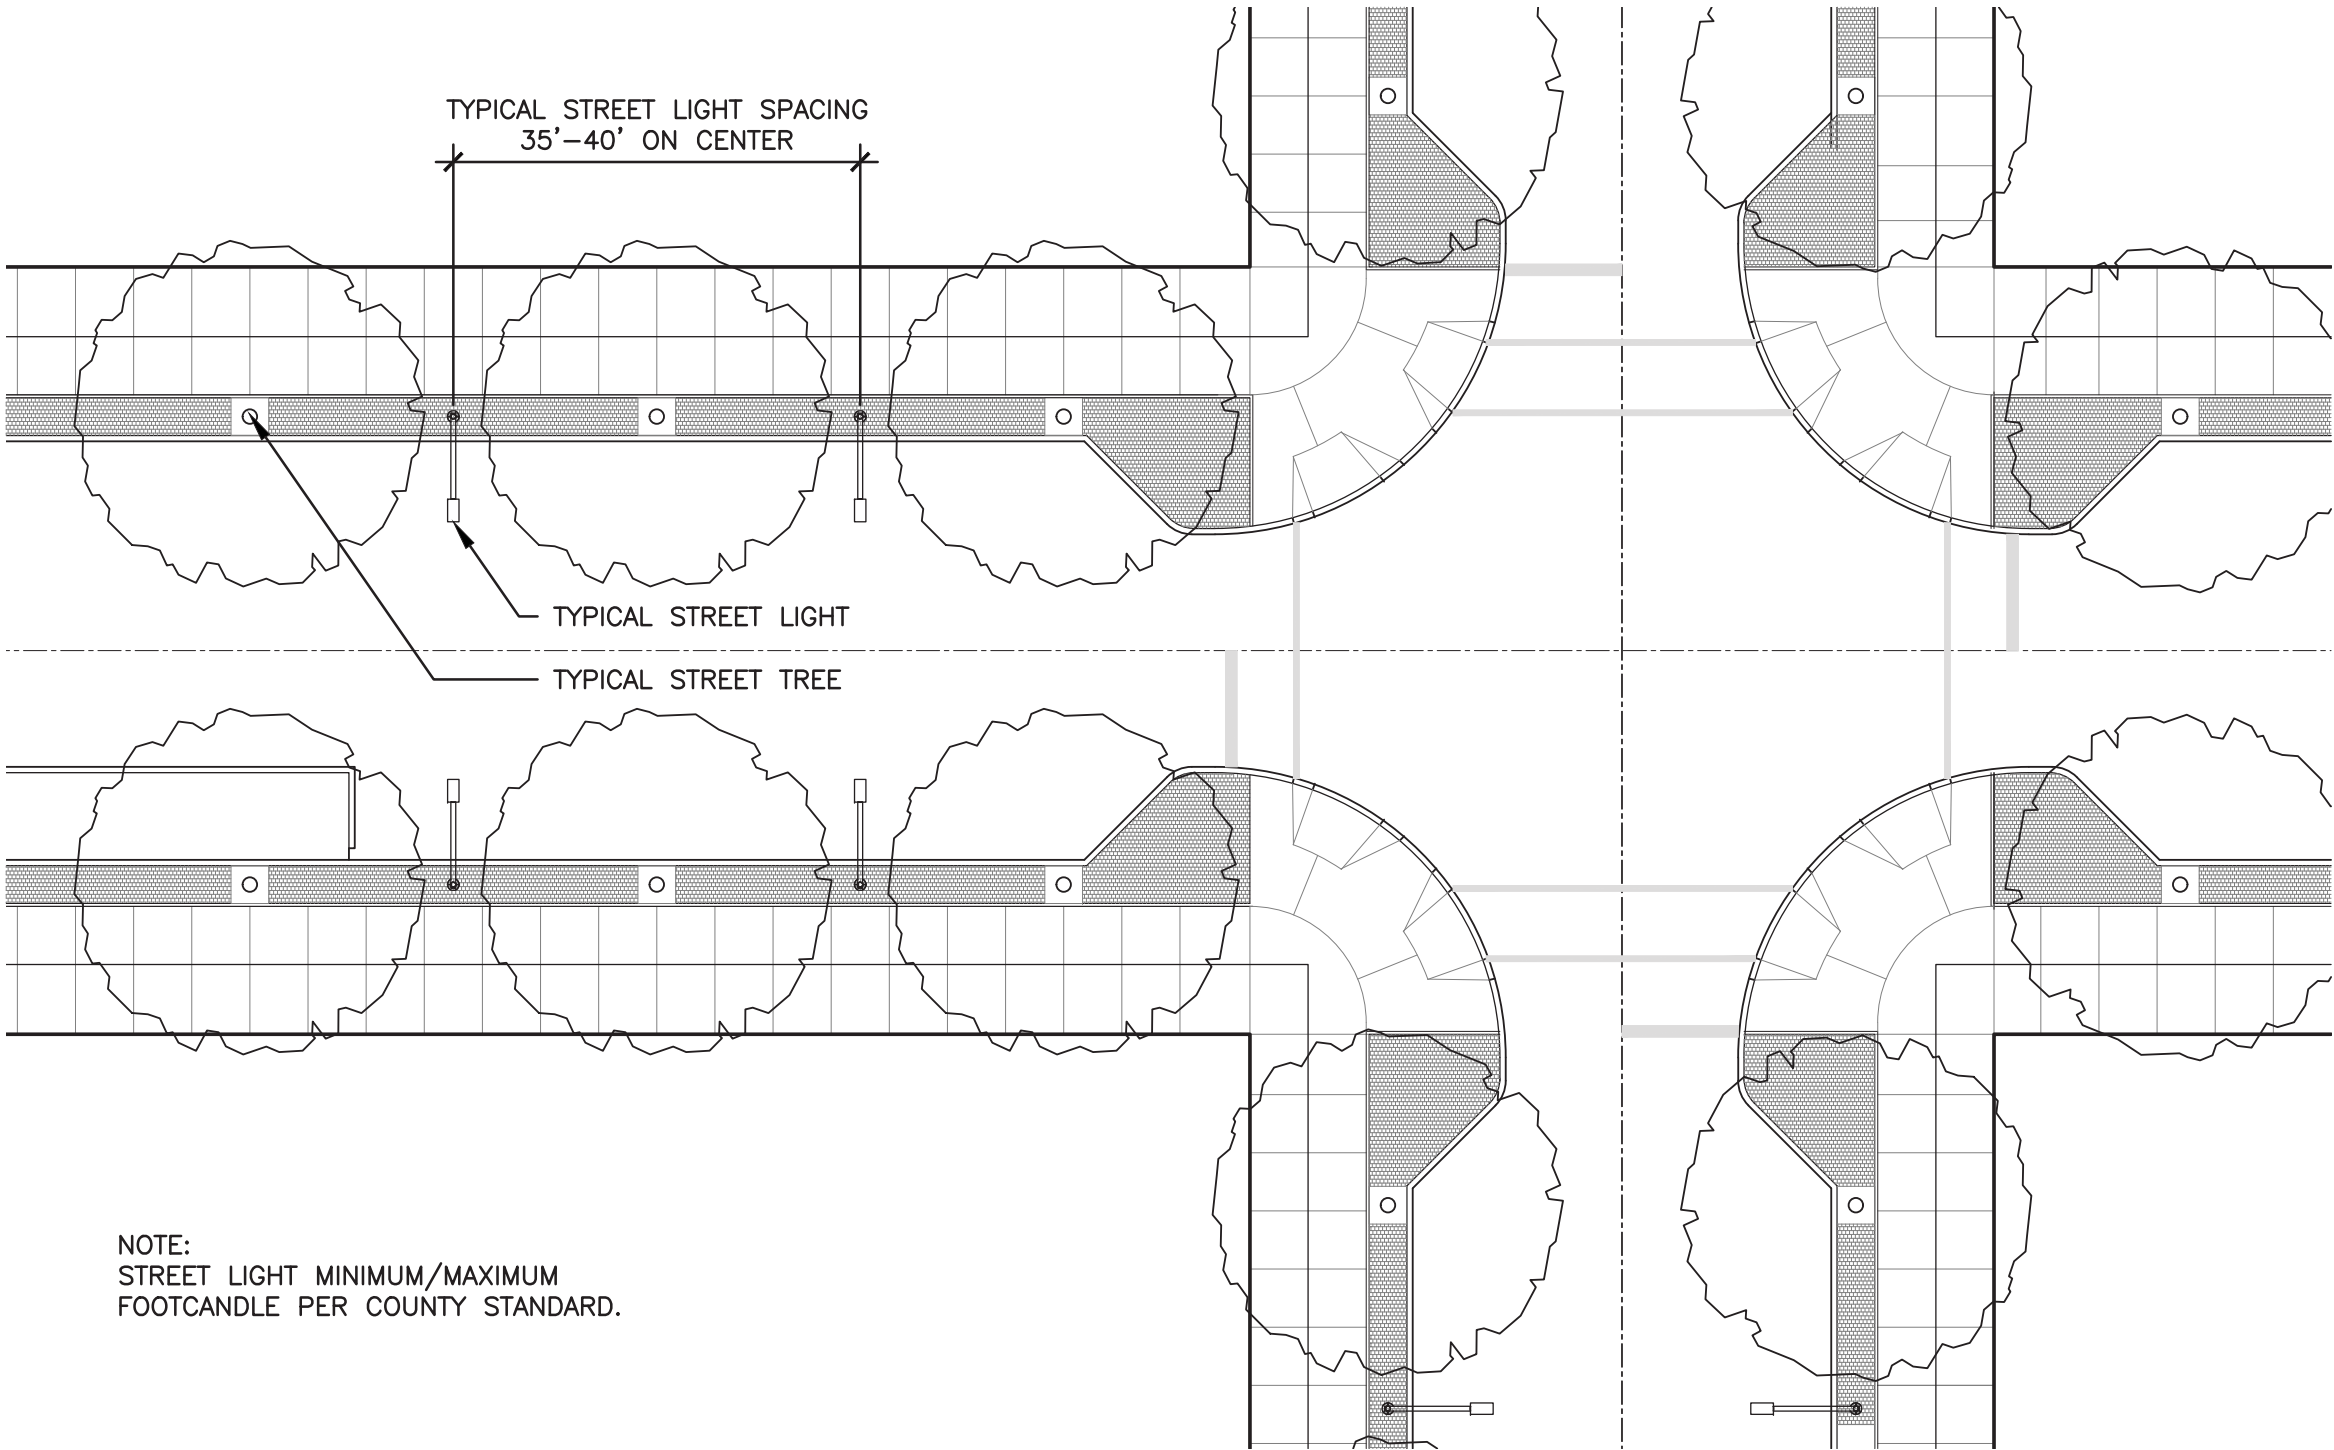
aa - INTERSECTIONS - CURB SECTIONS
